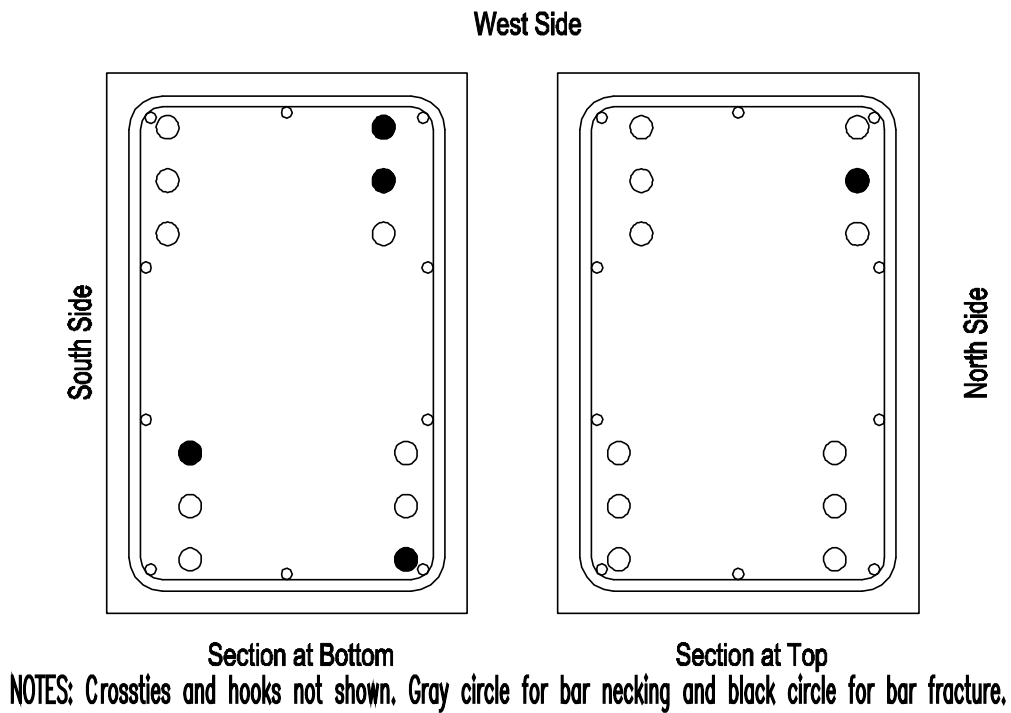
Reinforcing bar fracture locations, D120-2.5
